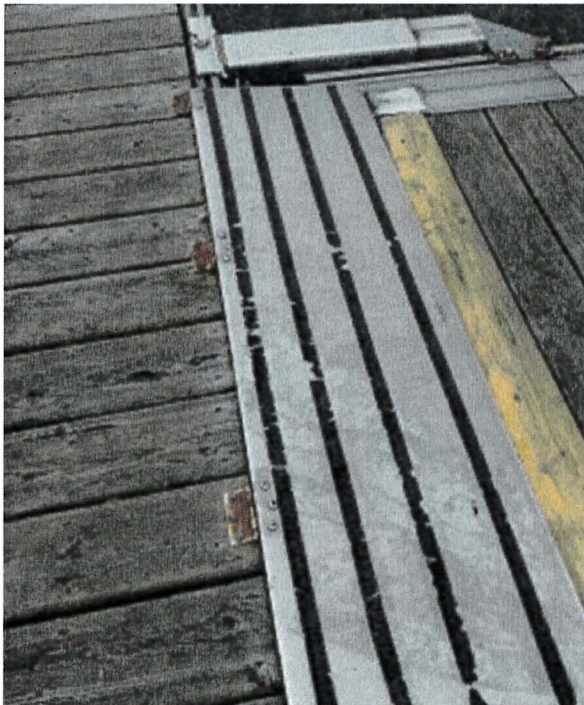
West Main – Dock I. Minor Moss Build-up on Deck Timbers and Stringers
